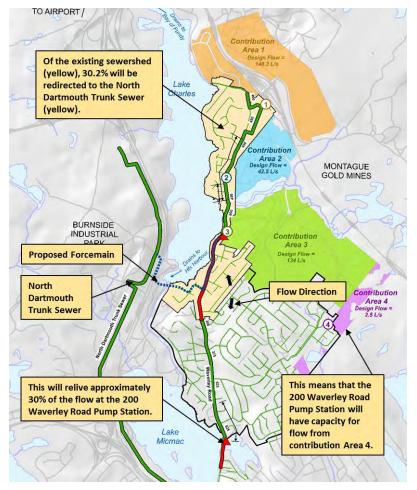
Proposed Rerouting of Flow from 390 Waverley Road Pump Station to North Dartmouth Trunk Sewer
